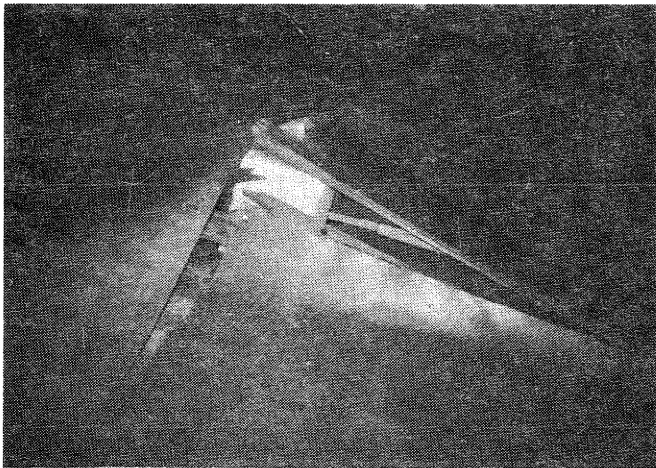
Houses which fell off their piles badly damaged the floor, apart from other damage
